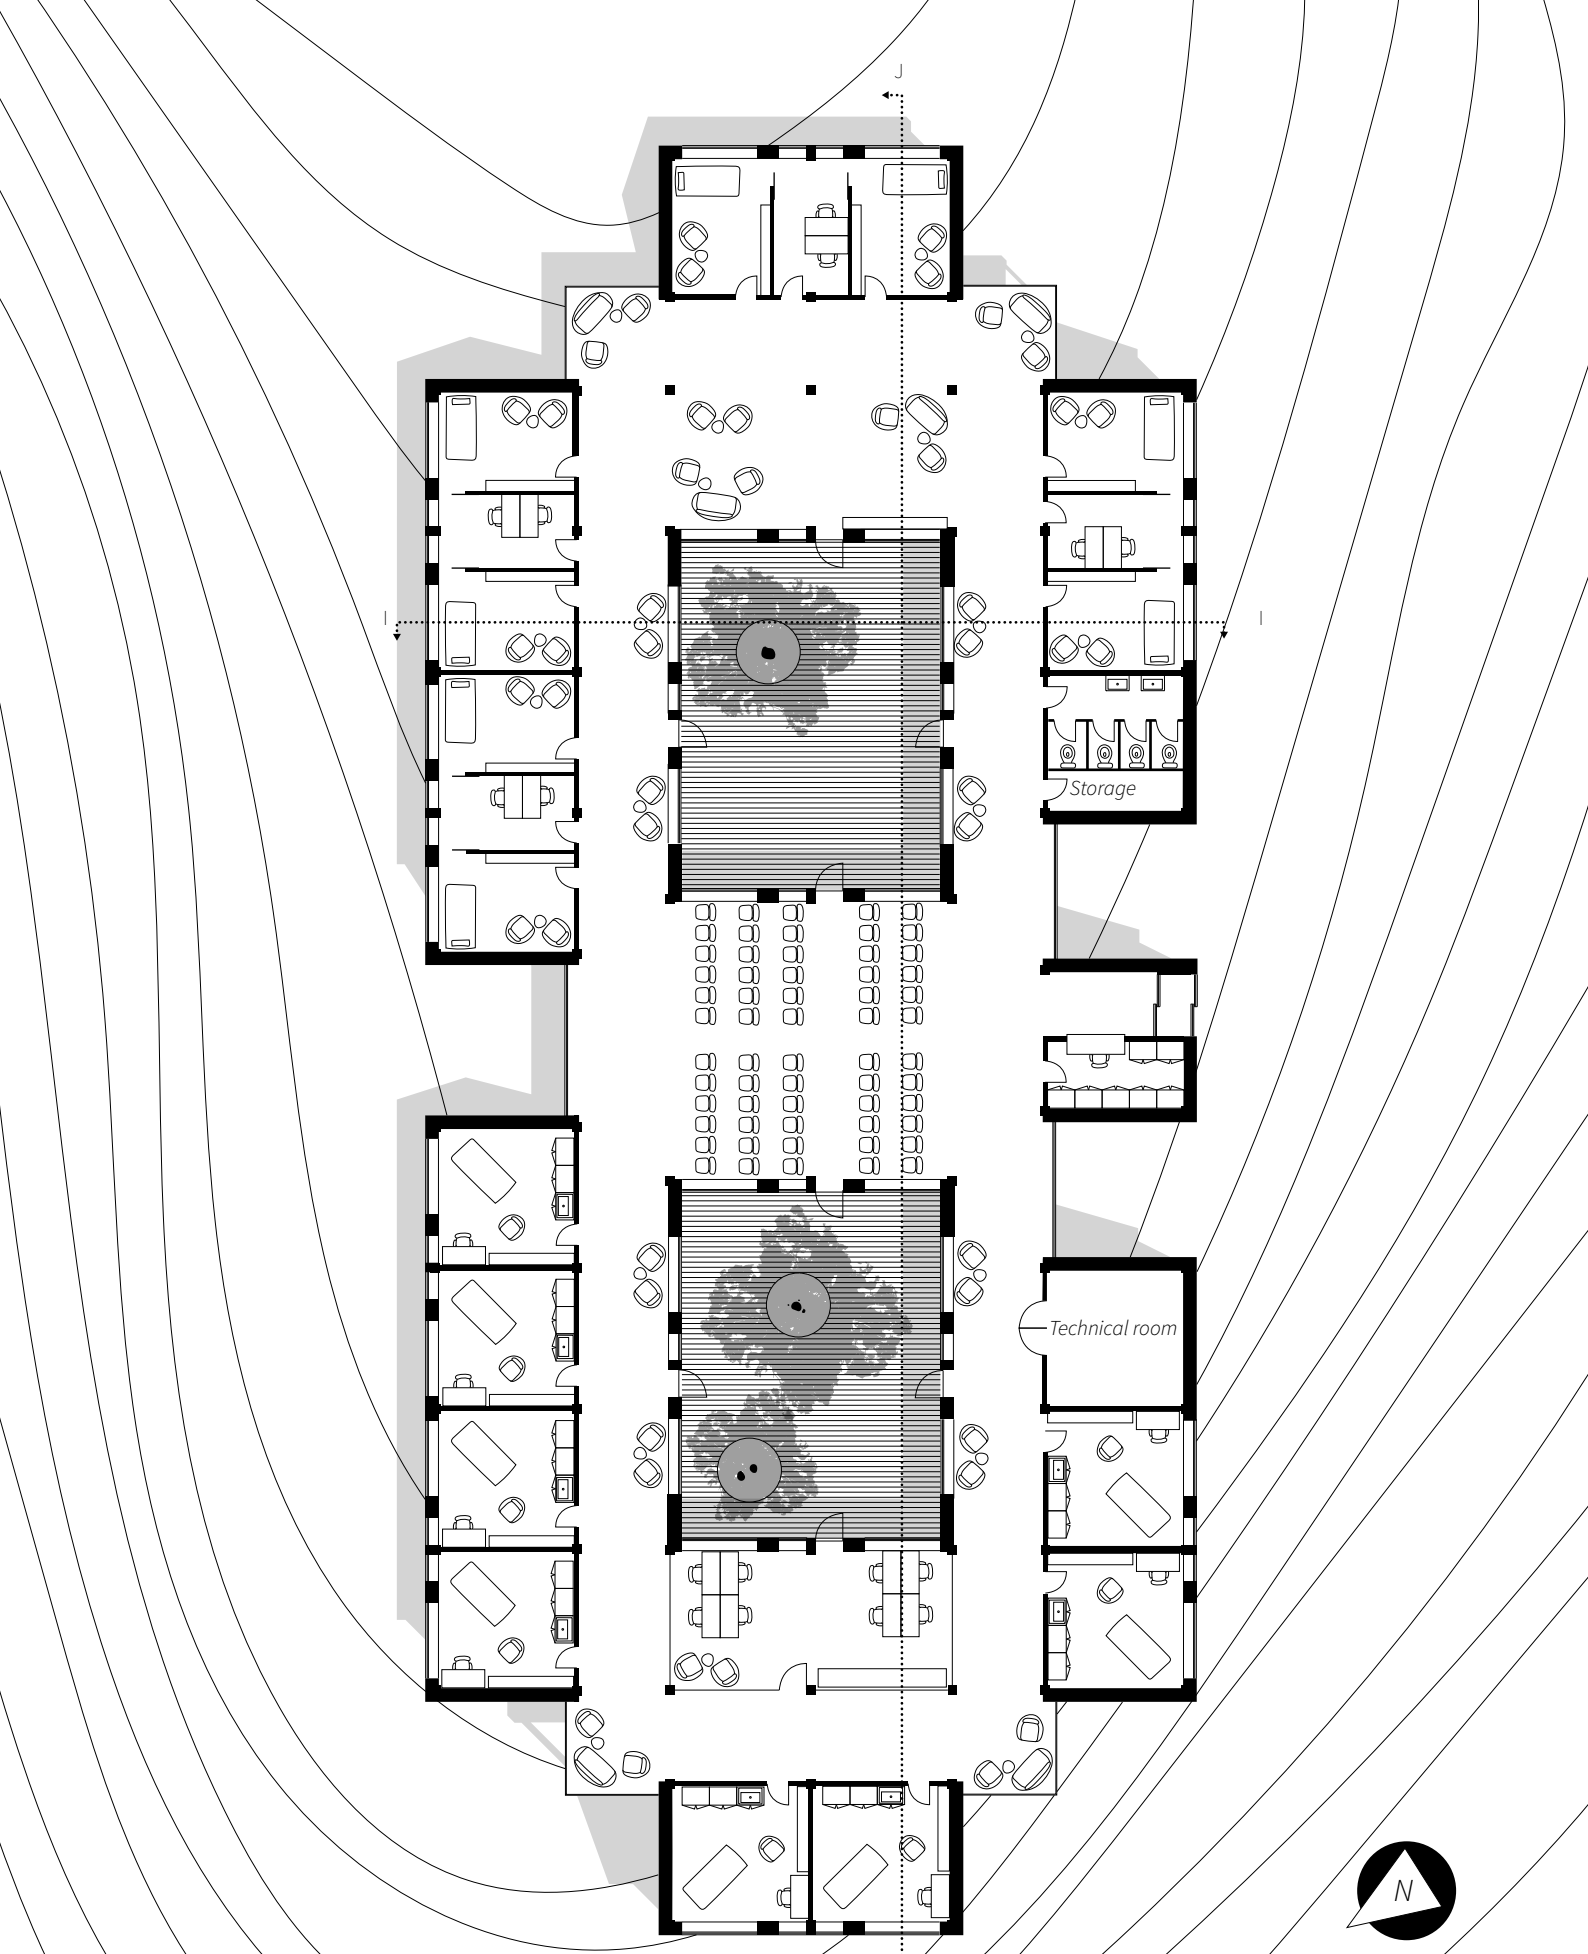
Floorplan (H-H) - Healthcare building -1:250
